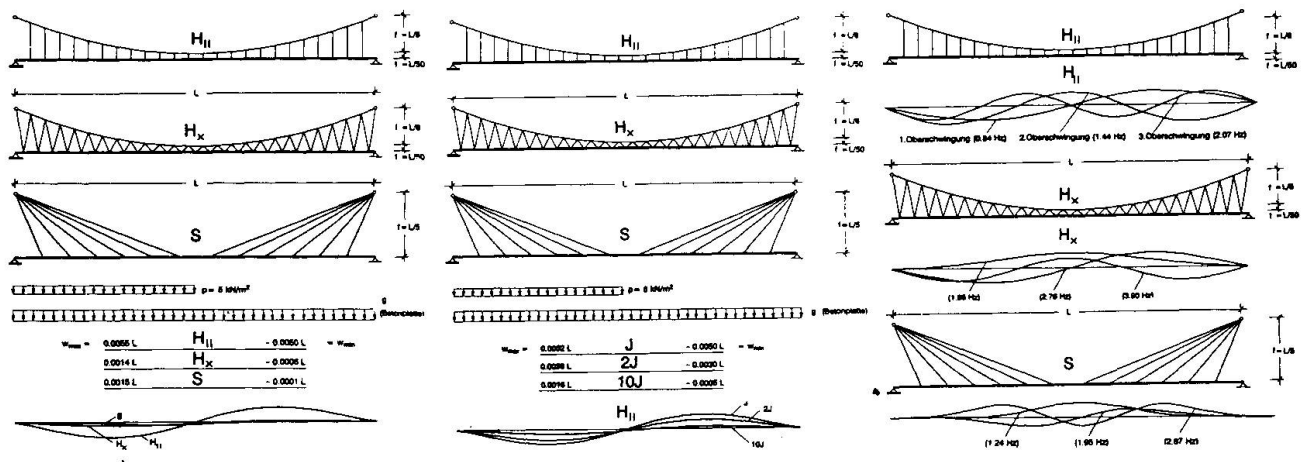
Comparison of deformations and frequencies of suspended girders with vertical hangers (H''), inclined hangers (H_x) and of cable-stayed girder (S) with varying moment of inertia J of the girder.
